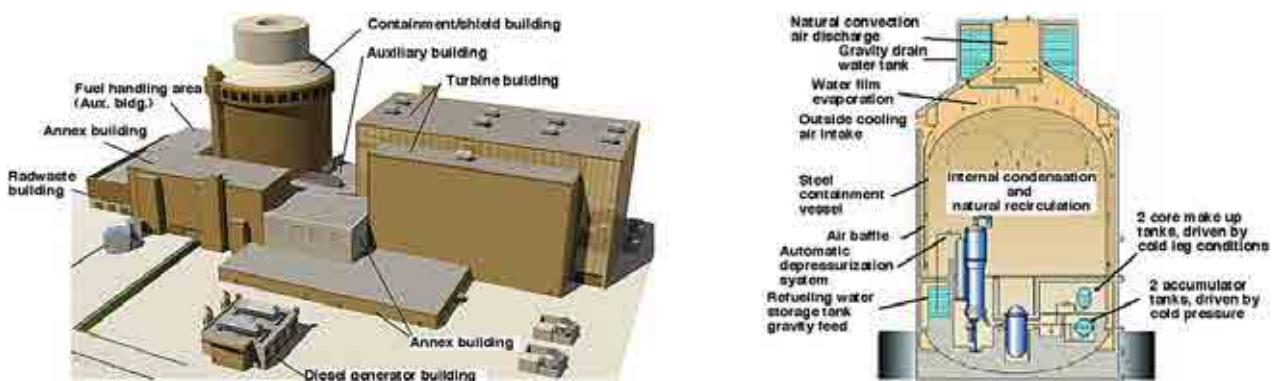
General view of AP-1000 plant and passive containment cooling system [590].
